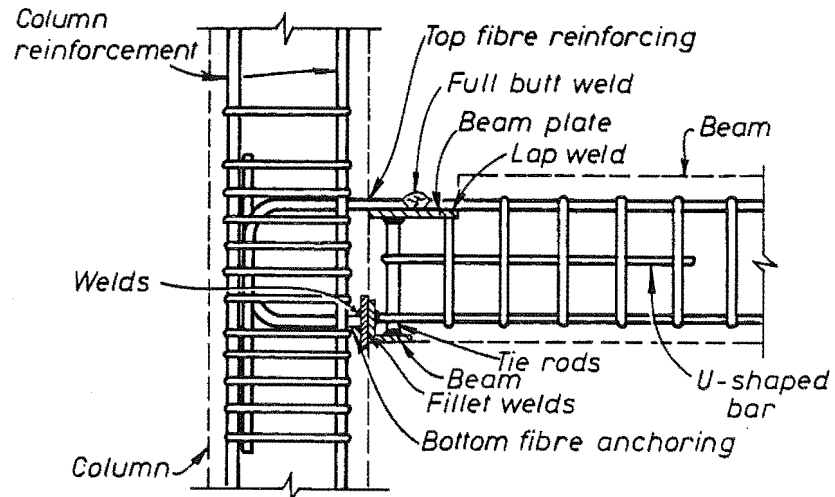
Connection Detail Tested by Pillai and Kirk (1981).
